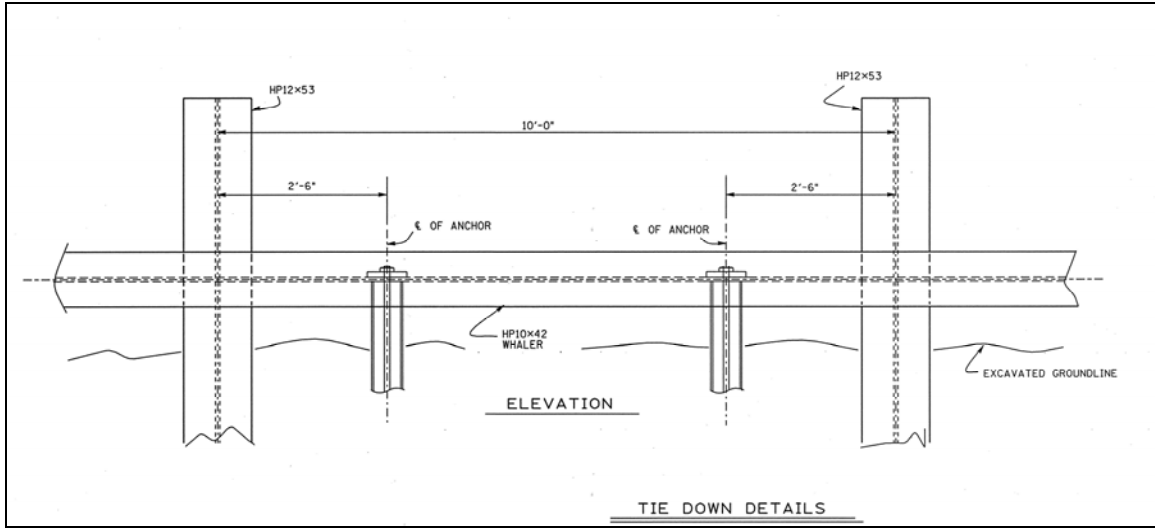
Pile Frame and Tie Down Elevation Detail
